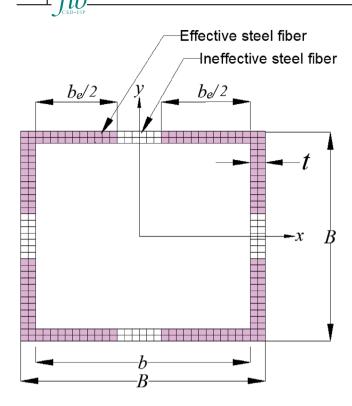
Effective width of the square tube of steelreinforced concrete-filled steel tubular column under axial loading.
